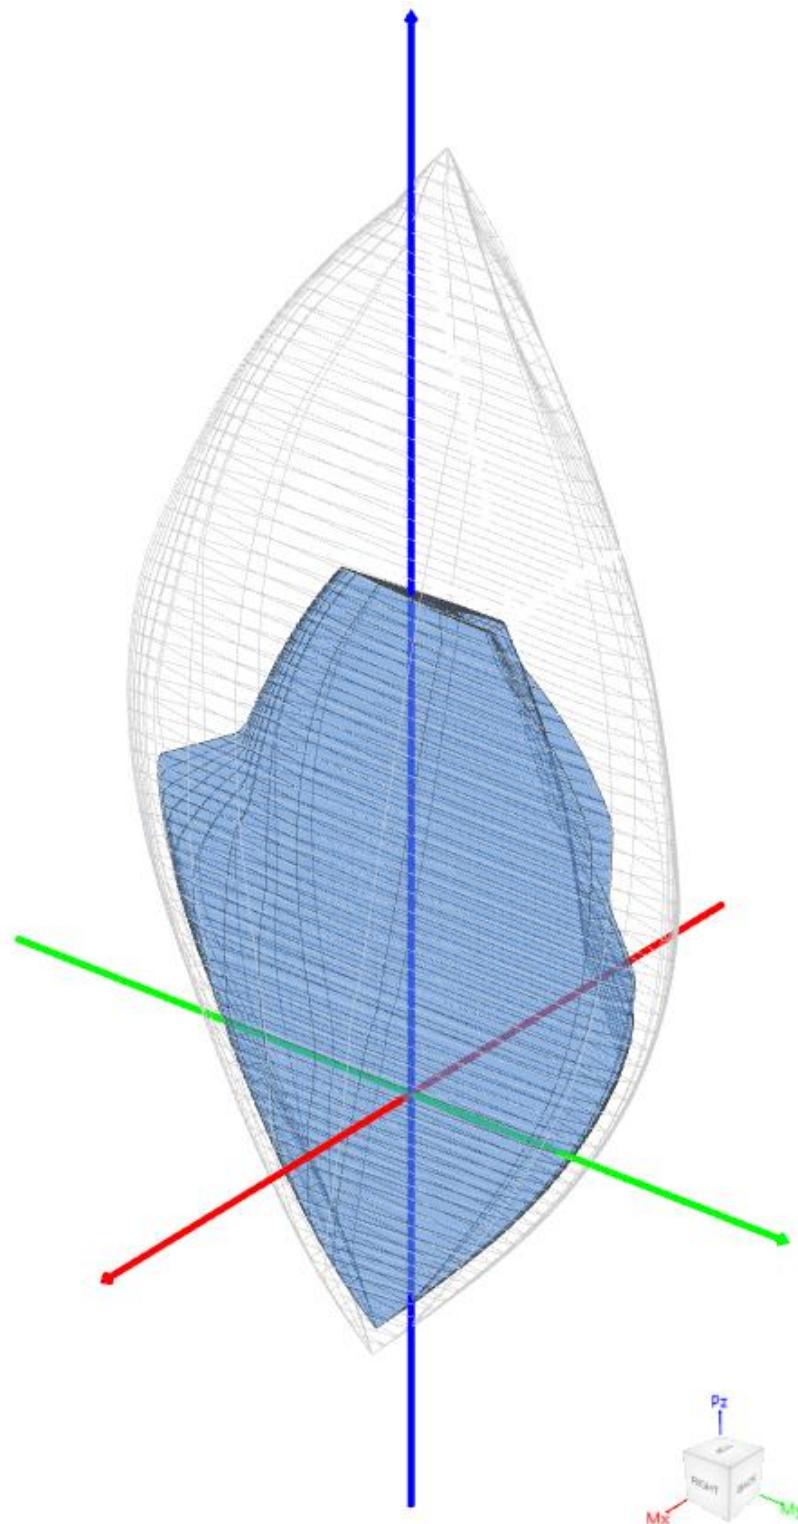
Revised Wall Nominal & Design 3D Failure Surfaces (Biaxial) ([spColumn](#))
